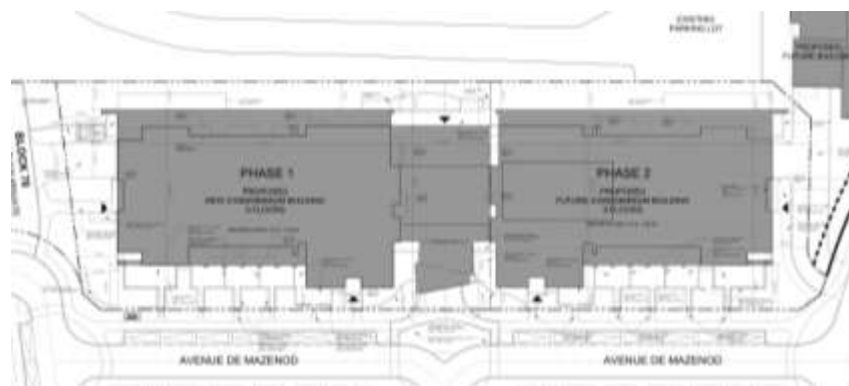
Site plan overlaid with building key plan of the condominium development. Credit: Greystone Village Inc.
